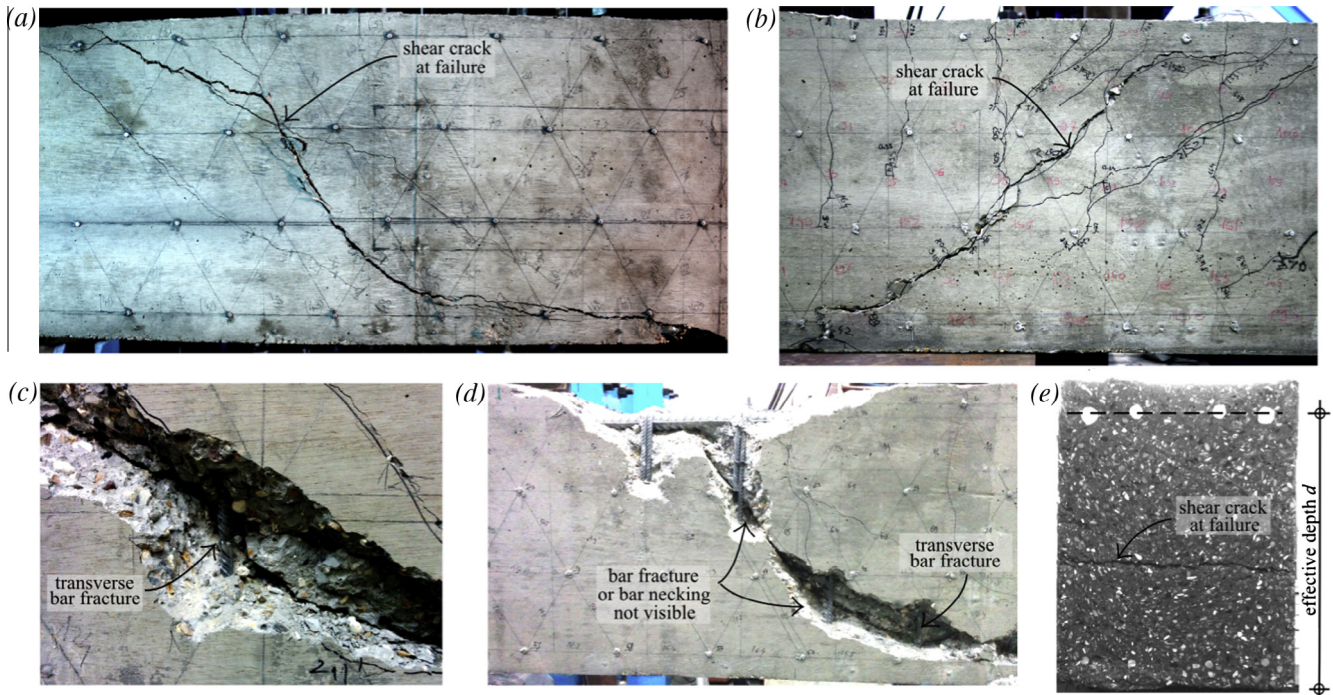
(a) Governing shear crack in B25-R10-W20-S8. (b) Governing shear crack in B10-R10-W20-S8. (c) Transverse bar fracture. (d) Flexure-shear failure. (e) Saw-cut through specimen.
